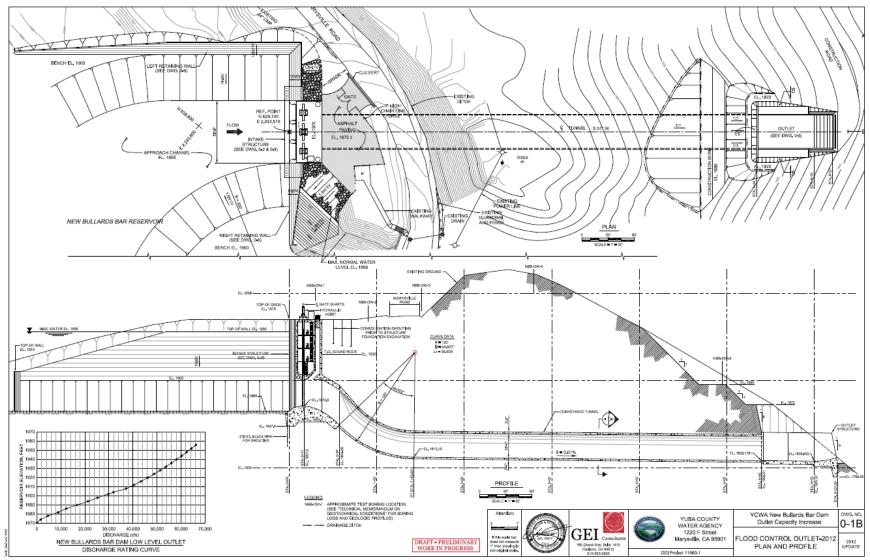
Conceptual level plan and profile for YCWA's proposed New Bullards Bar Dam flood control outlet.
